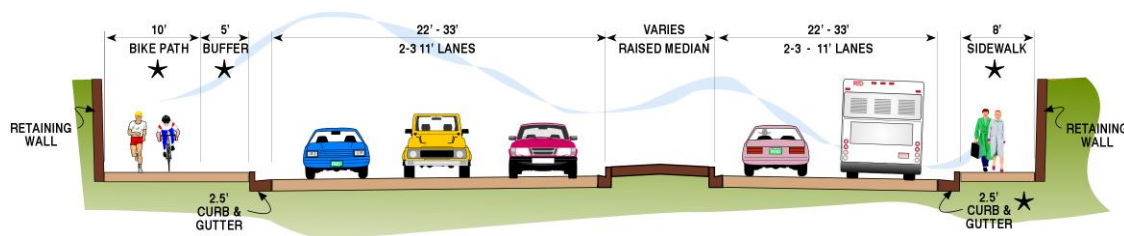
System Alternative 2, Alameda Avenue – Santa Fe Drive to Cherokee Street
